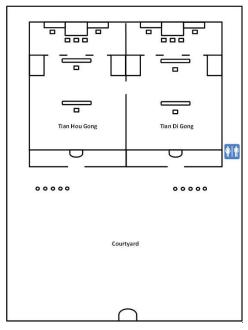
Digitised floor plan of Fuk Tai Chi Museum
